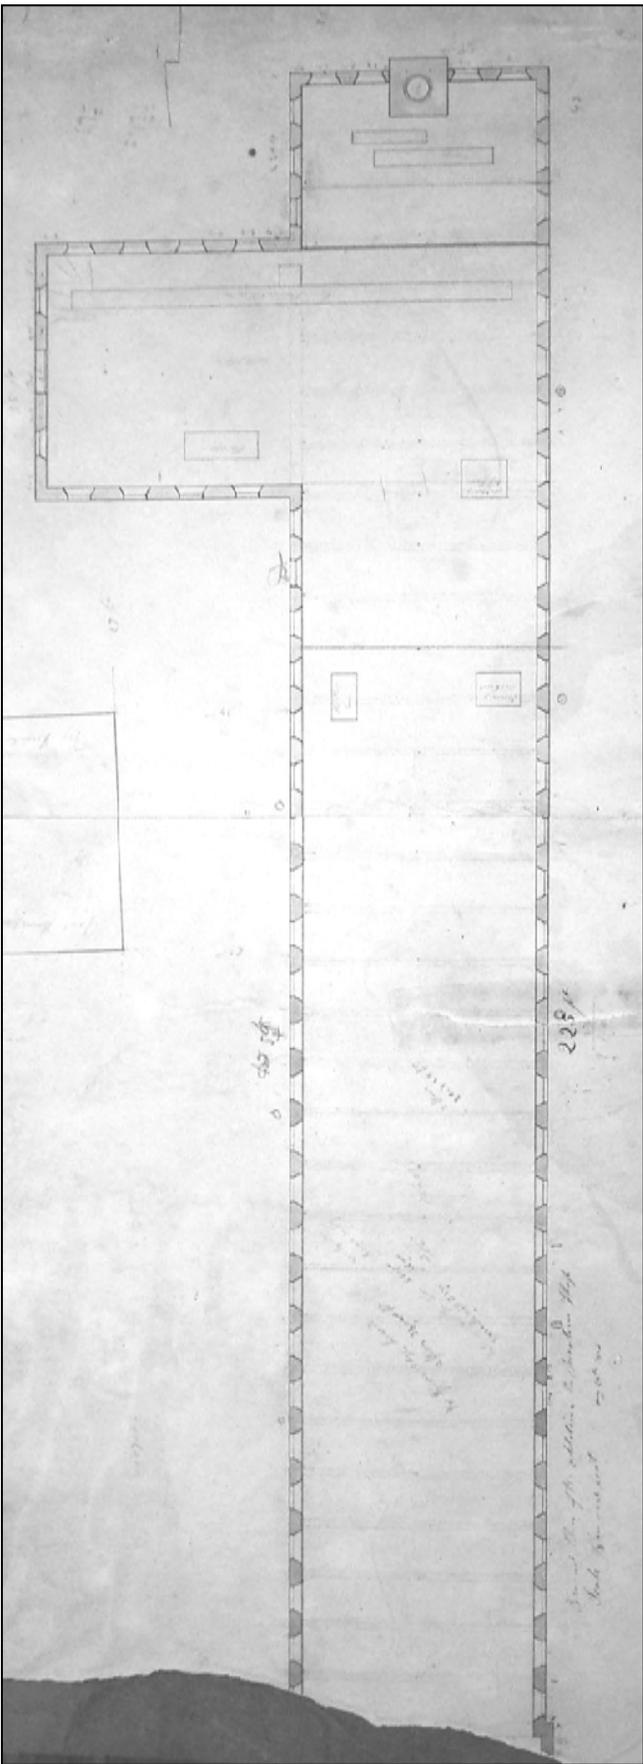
“Ground plan of the addition to Machine Shop, Aug 24th 1863.” The drawing depicts the basement plan of the northeast block and west ell of Building 27; not to scale.
